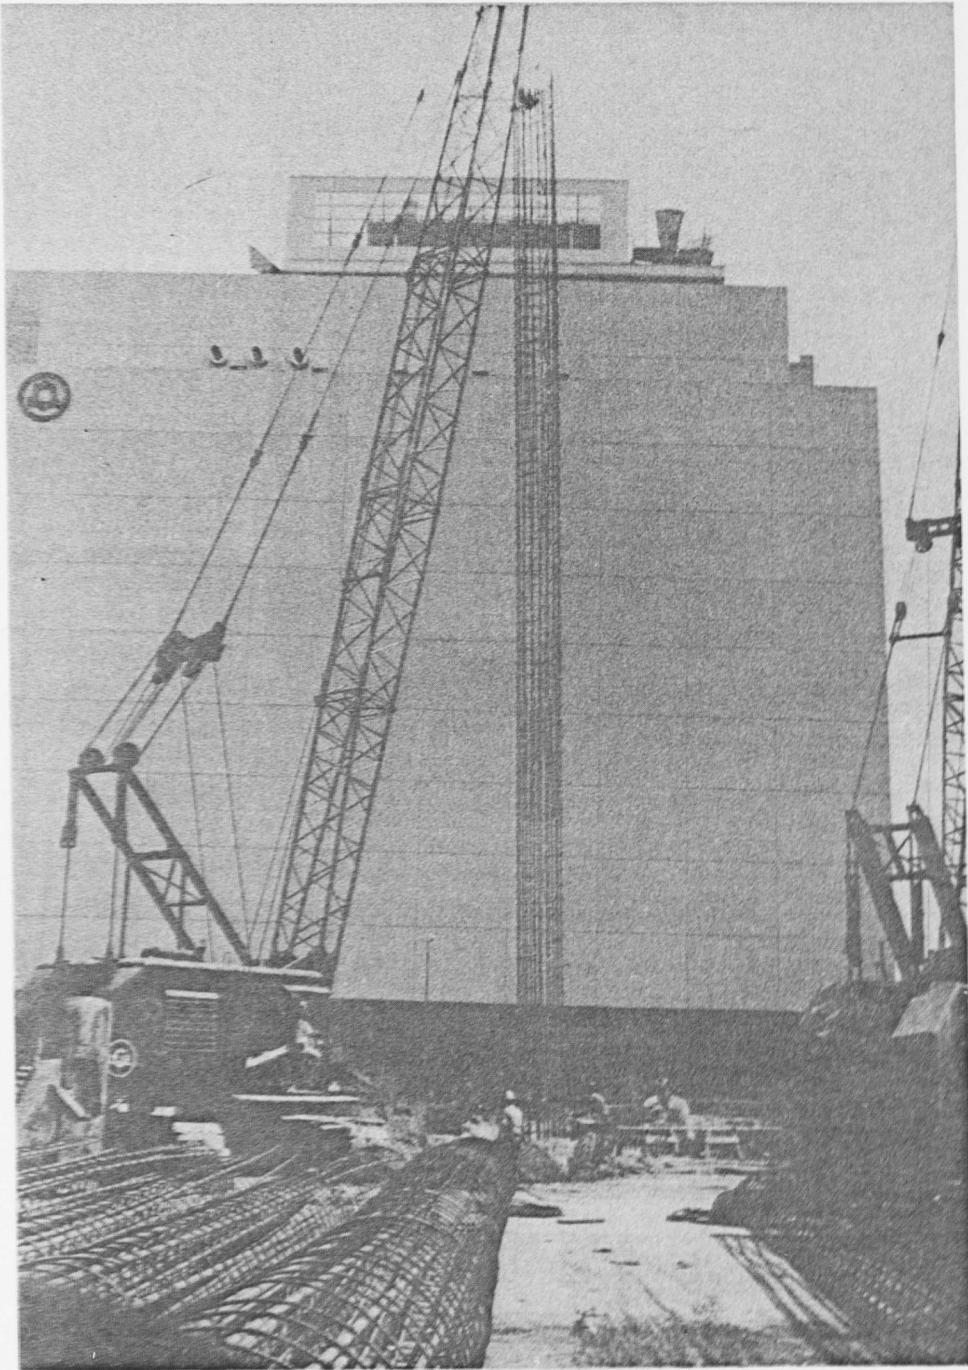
INSTRUMENTED REINFORCING CAGE
